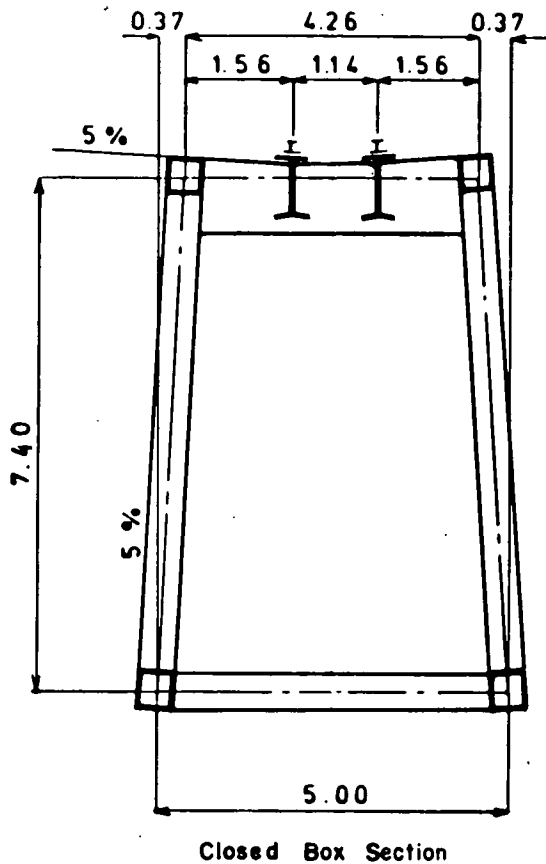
Cross section of railway truss bridge with box members built in Japan. [Yamada 1983]
